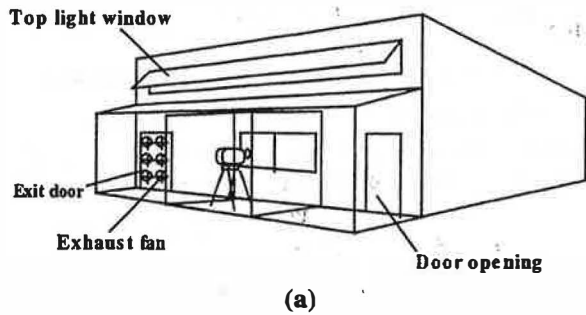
Test house with shed roof. (a) Out of view. (b) Test house section.
